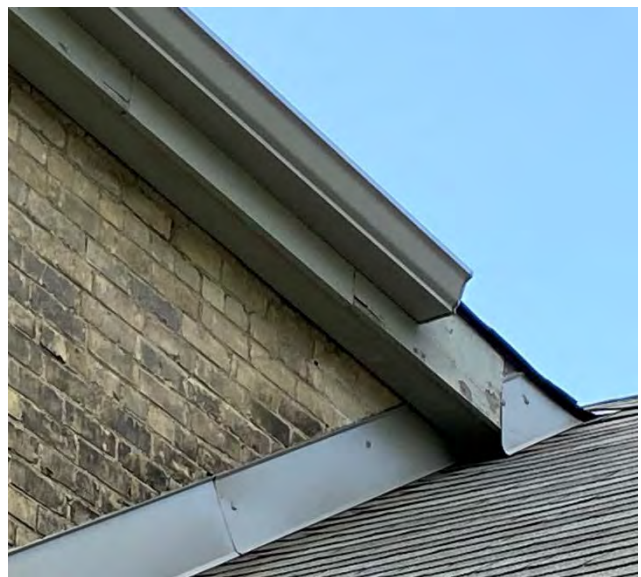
East Elevation Fascia Detail (Photo No. 8.0)
